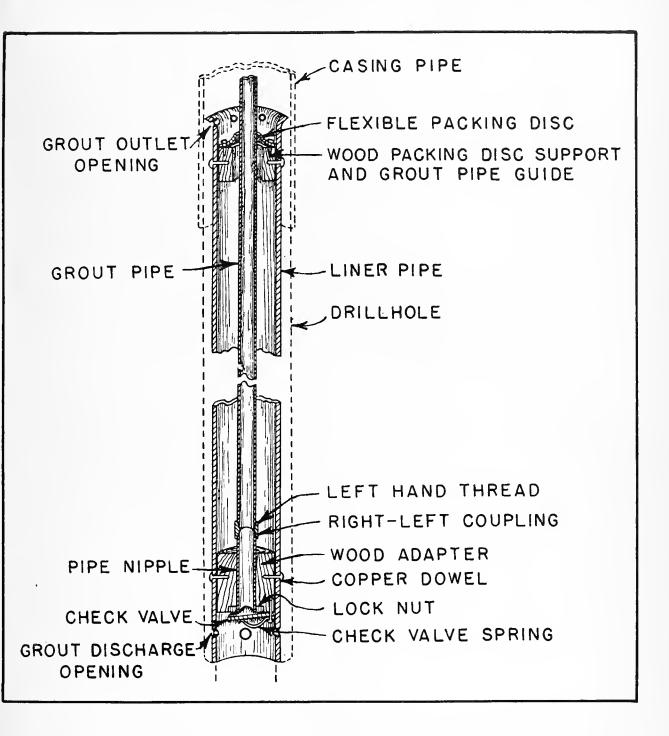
Detail Showing Arrangement of Grout and Liner Pipe.
